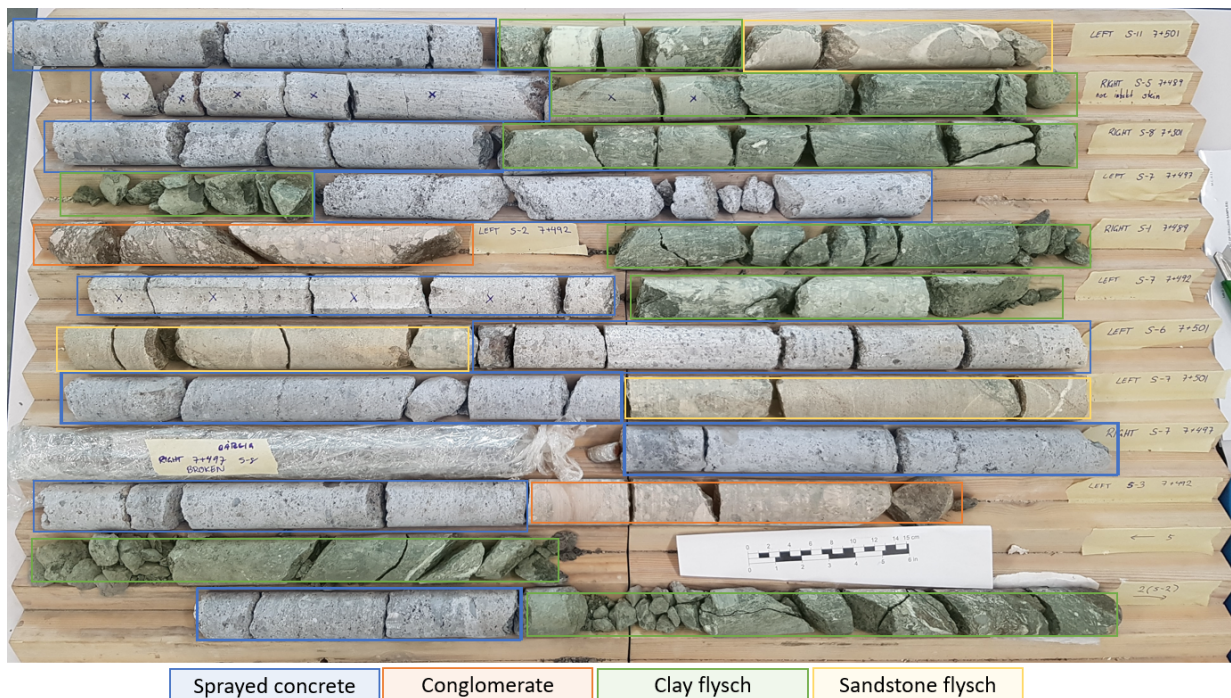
Sprayed concrete and rock material cores extracted from chainage 7+492 to 7+501 at Moglice HPP headrace tunnel. Sections marked with an x, are of crescent shape and unsuitable for testing.
